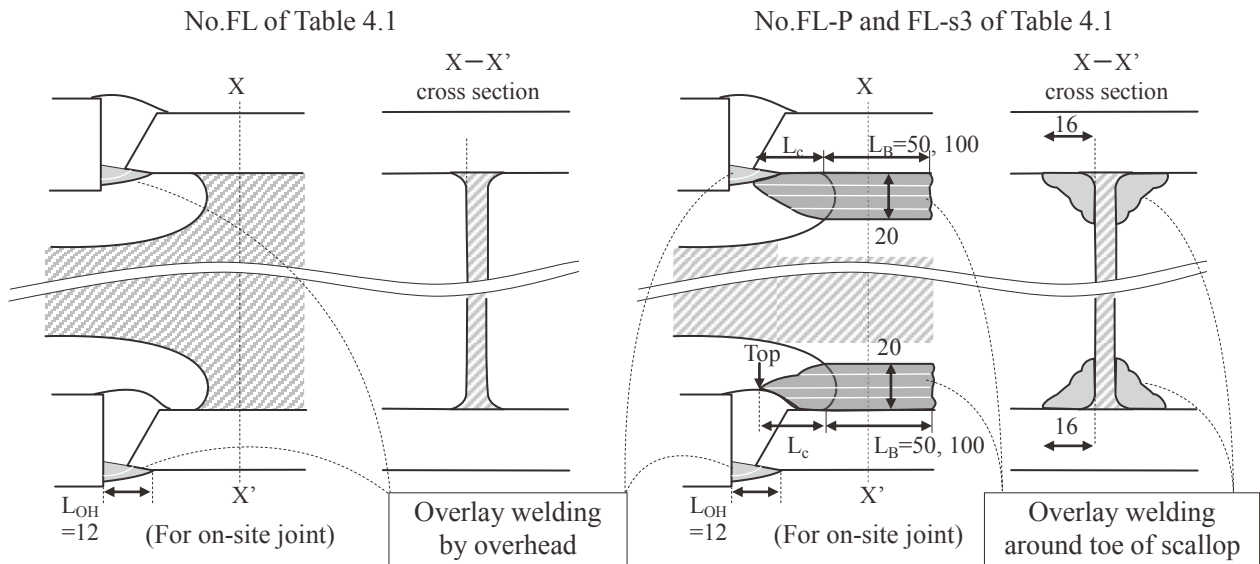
Management target of the overlay welding method around toes of scallops and the overlay by overhead welding without backing plate. (Unit; mm)
